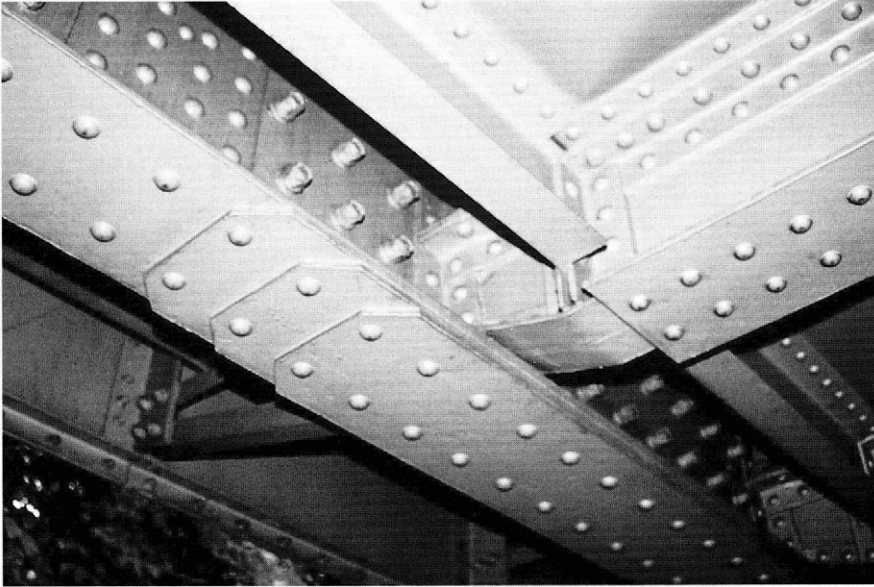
Typical detail of riveted steel bridges where a crack in a covered plate is invisible
